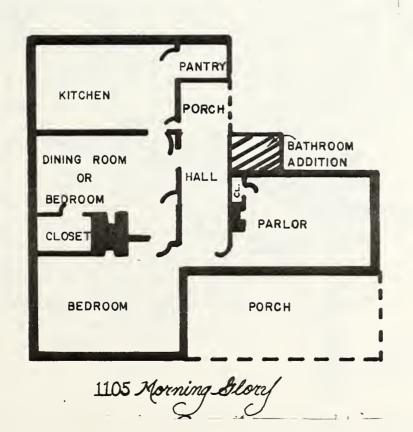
Floor plan 4-room mill house, Golden Belt.
